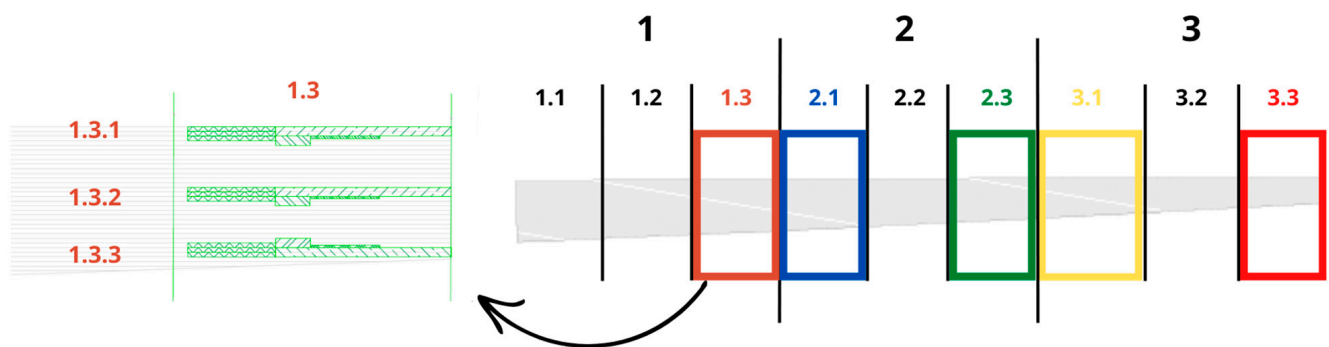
Glulam beam sectioning and sub-section specimen choice.
